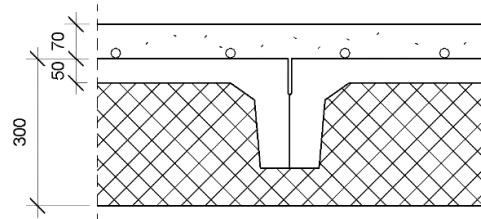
DESIGN 1 PREFAB CONCRETE
